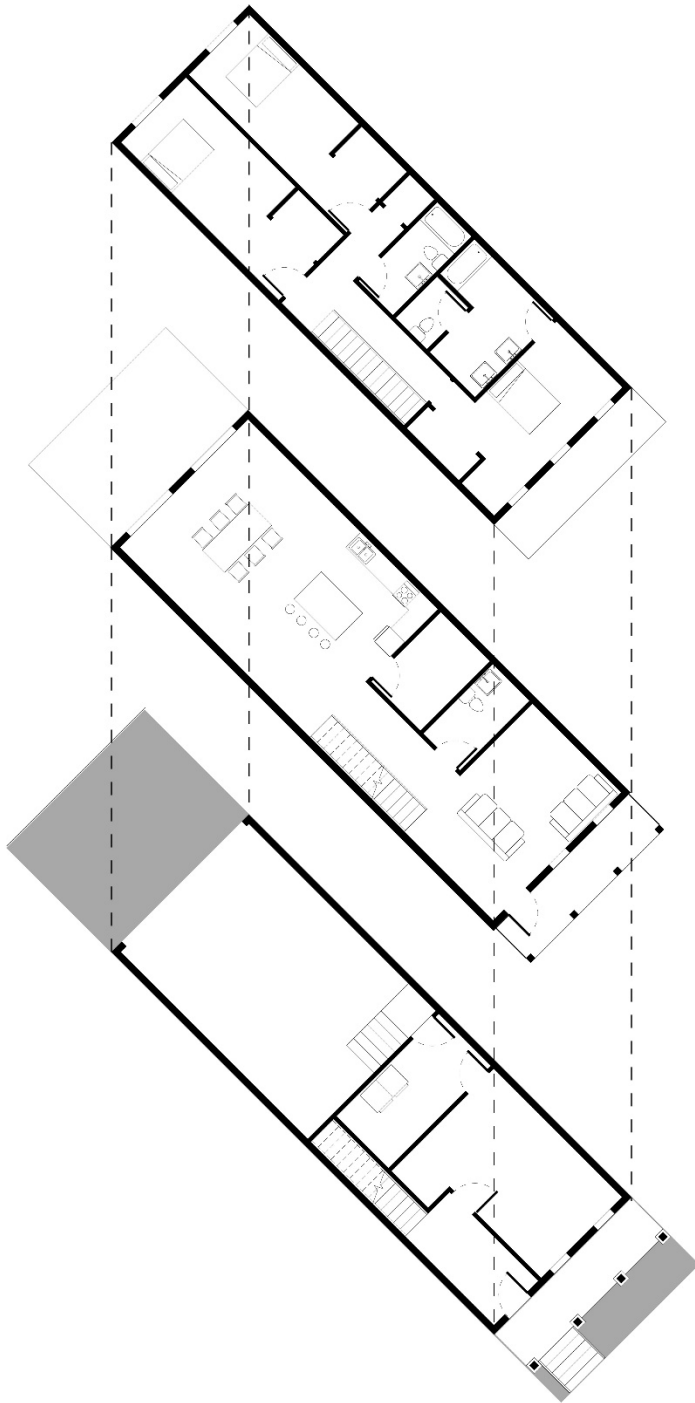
Plan of a Townhouse within the lot size (Source: Author)
